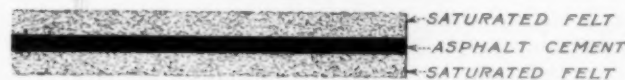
ENLARGED CROSS-SECTION MULTIPLE LAYER PREPARED ROOFING
